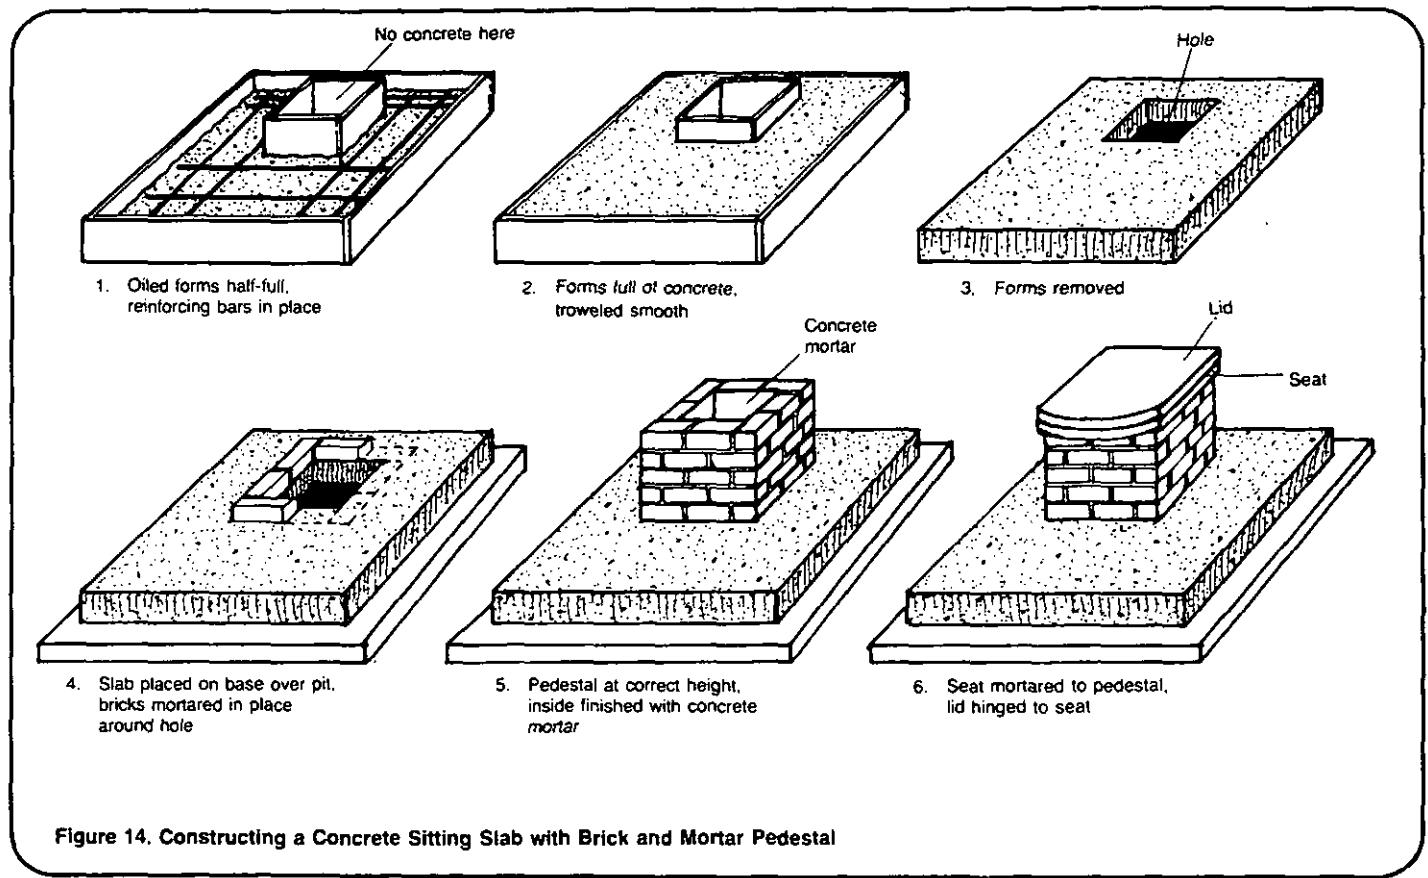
Constructing a Concrete Sitting Slab with Brick and Mortar Pedestal
